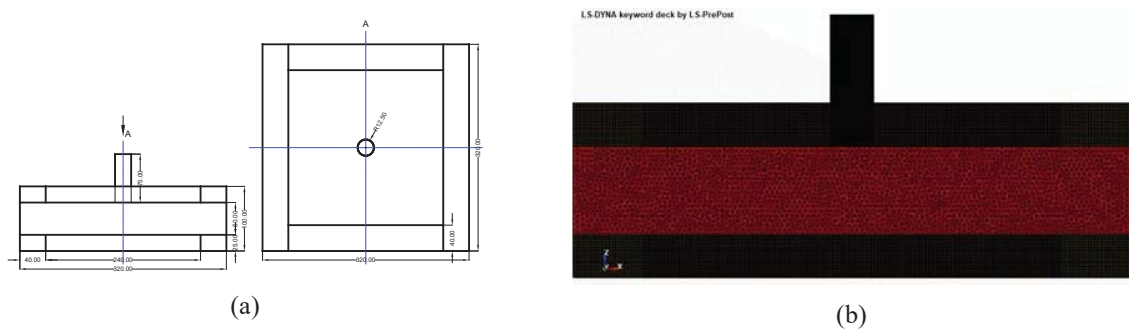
(a) dimensions of concrete block, unit [mm], (b) finite element model of concrete block
